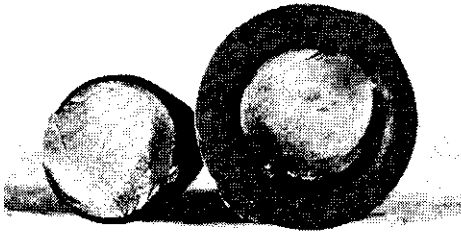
Fracture surface of Grip Joint (GJ254)
